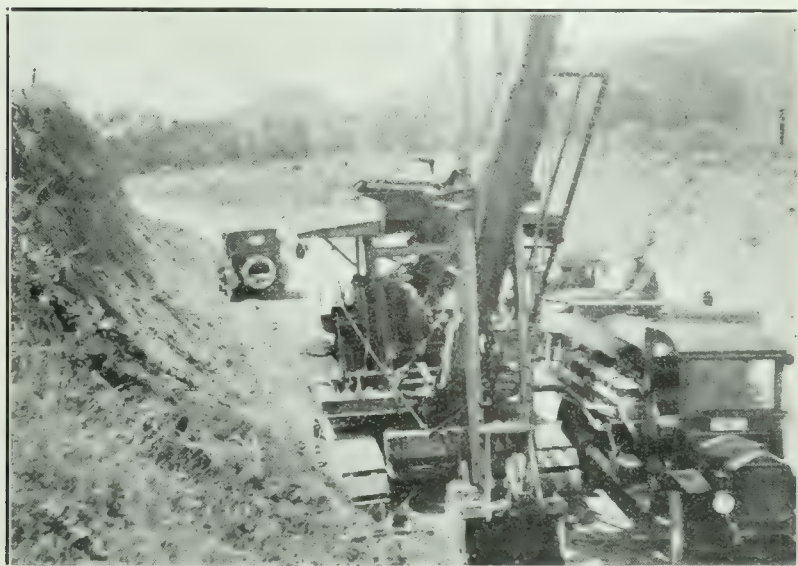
Plate XI. Widening roadway on State Highway in Santa Barbara County.
